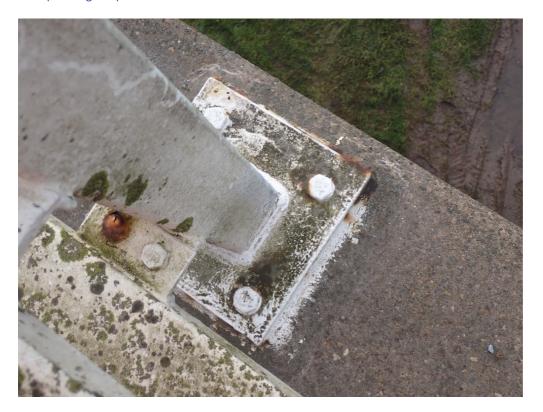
Typical cracking to Parapet base plate mortar
